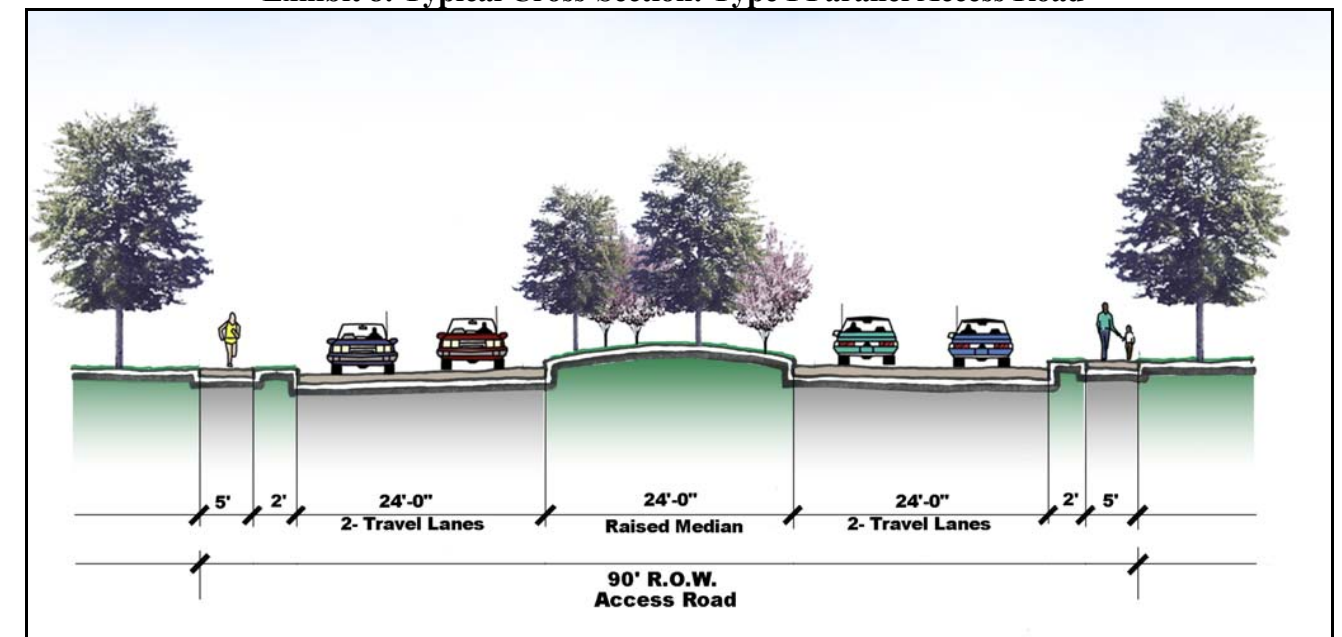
Typical Cross-Section: Type II Parallel Access Road
